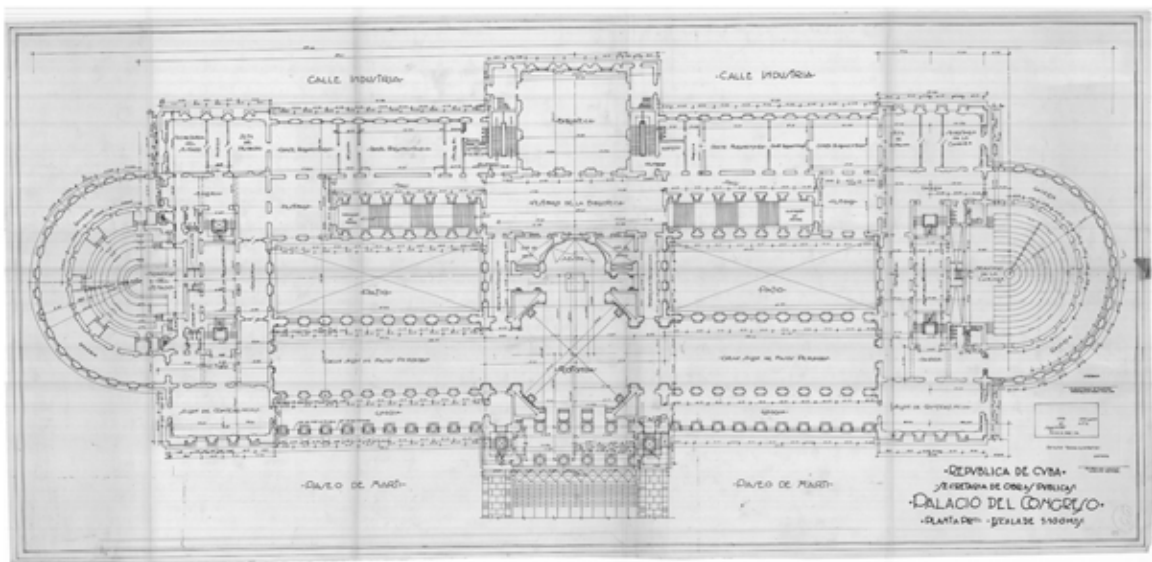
Second (Main) Floor Plan. Source: Hand-drawn plans of the Capitol building.
